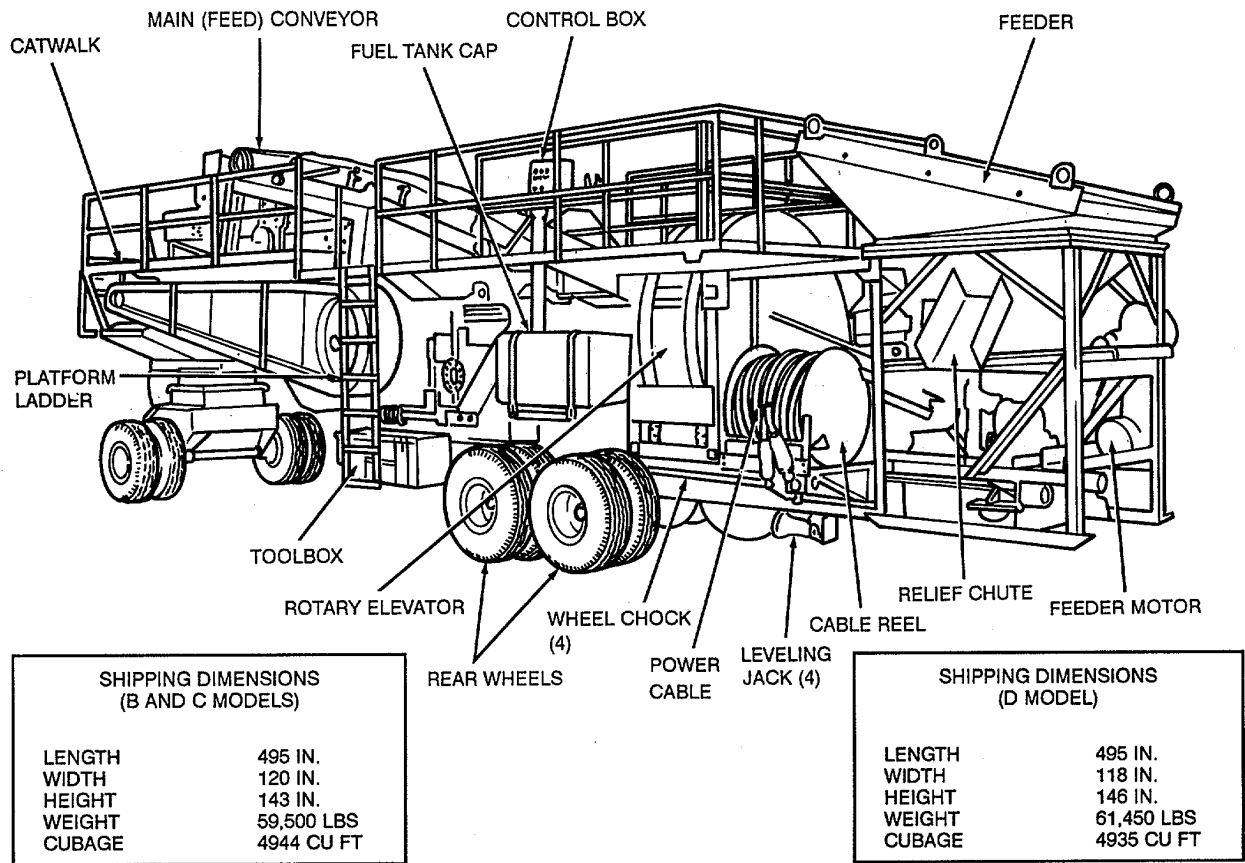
Roll crusher, left rear, three-quarter view (Model 523B, C).
